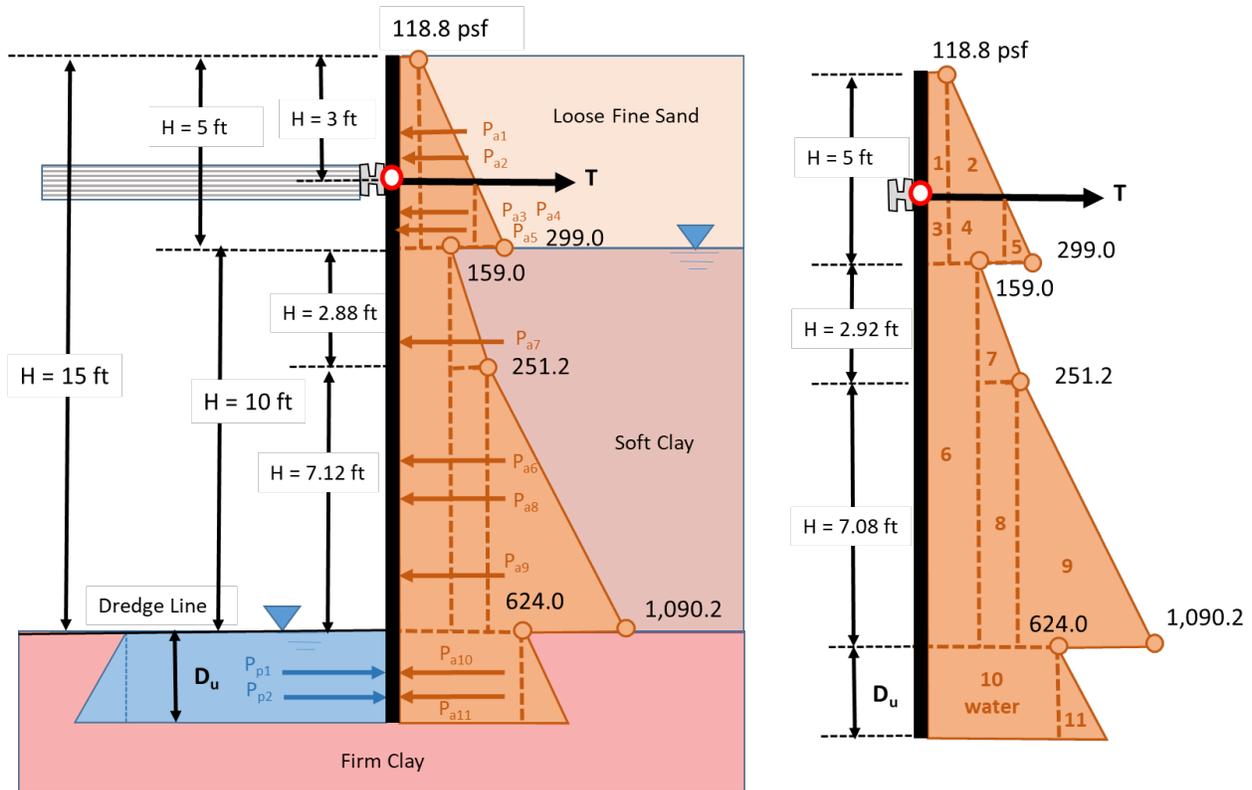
Case 6 Lateral and passive forces acting on the wall.
